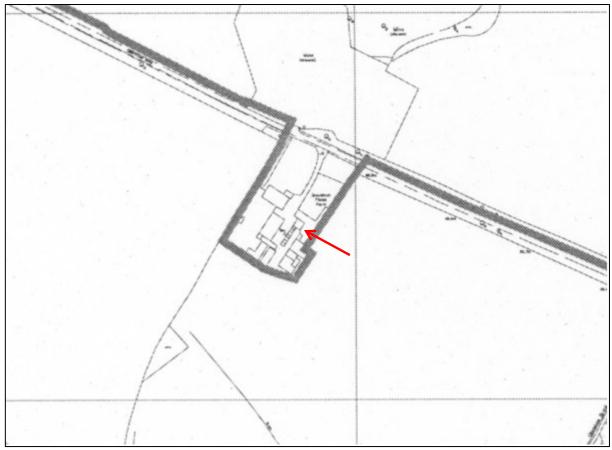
Site plan, with arrow indicating location of buildings subject to survey.
